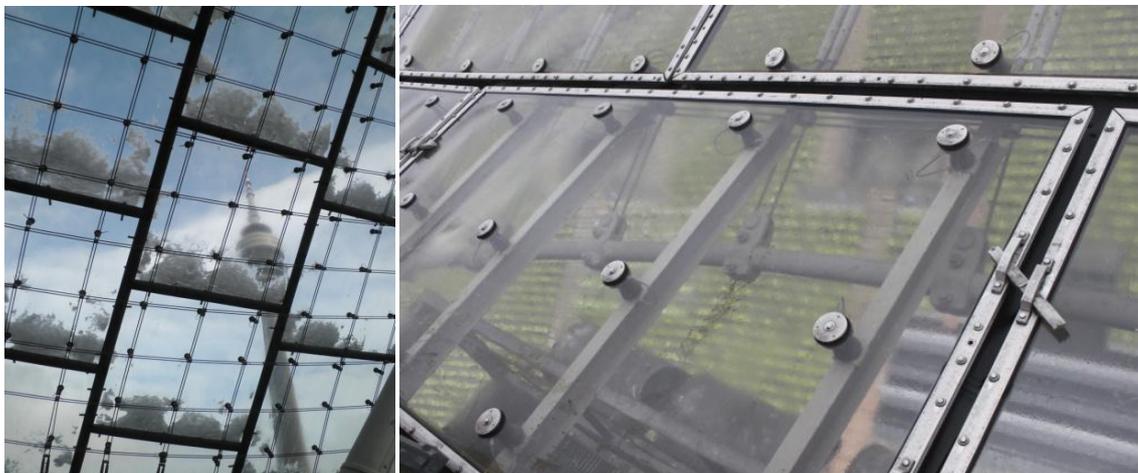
Detailed view to the Olympic stadium roof, Munich, Germany [by author, 1/2014]
